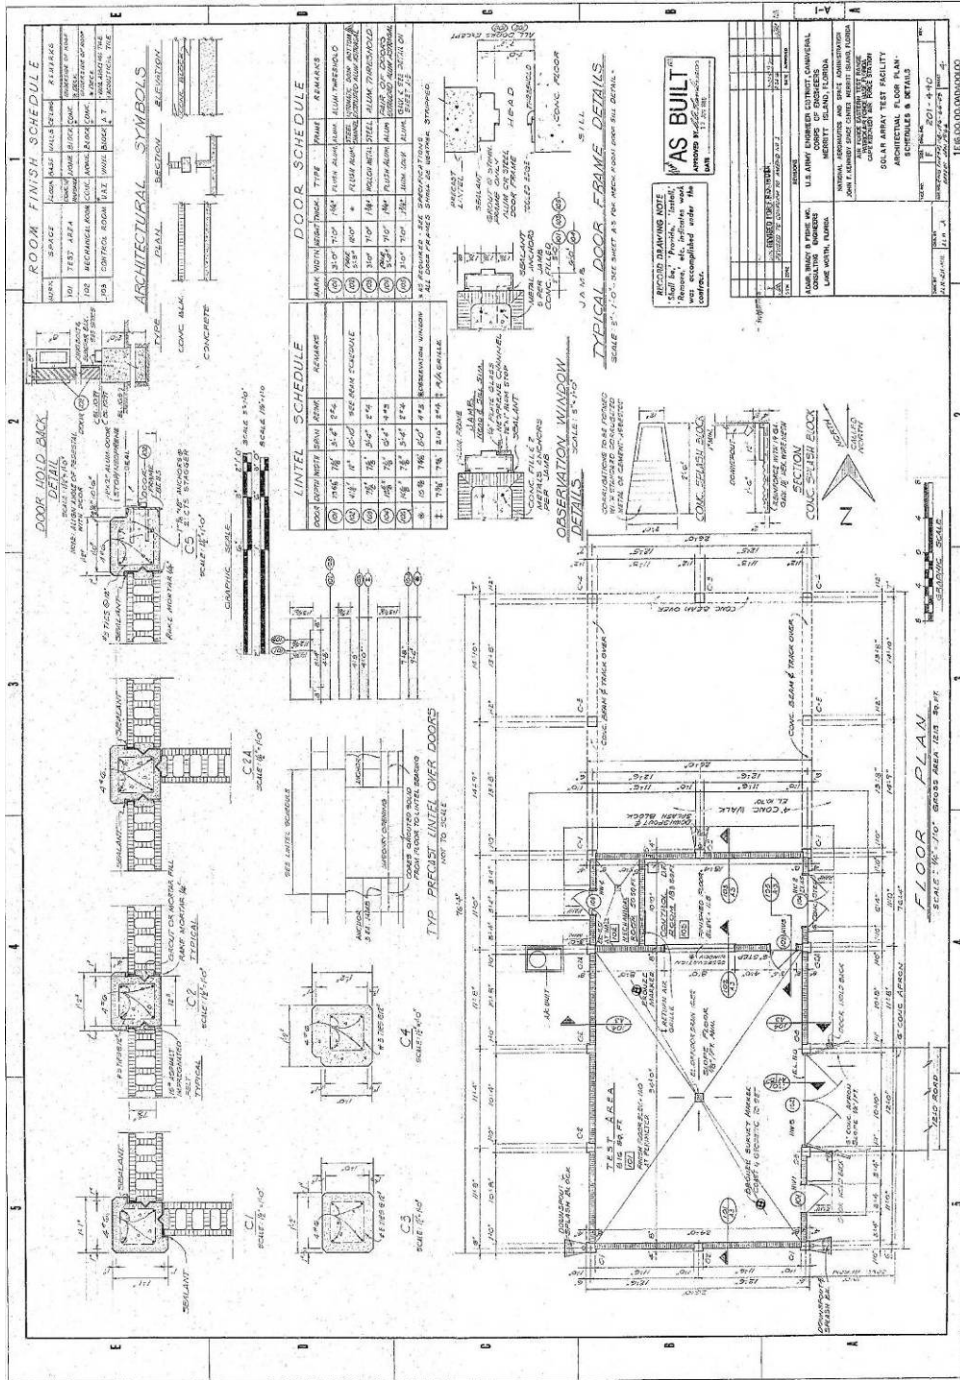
Adair, Brady & Fishe, Inc., Solar Array Test Facility, Architectural Floor Plan-Schedules & Details, January 1966, Sheet 4.
